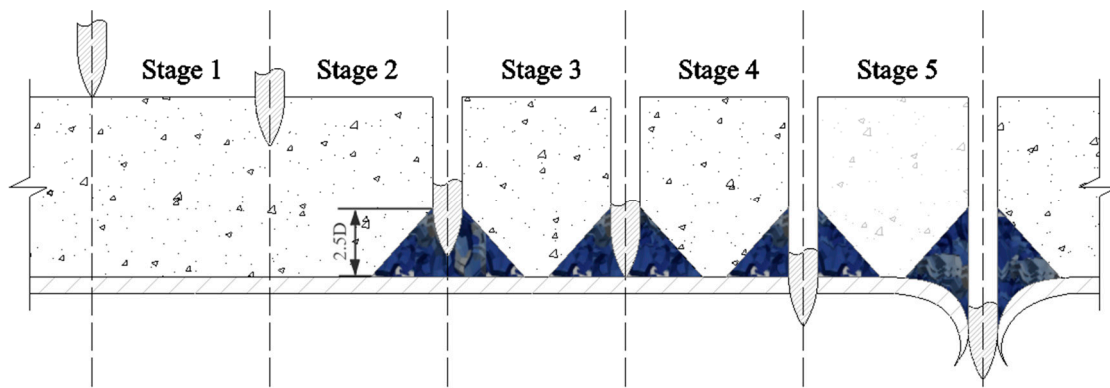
Diagram of a projectile penetrating a steel plate reinforced concrete wall.
